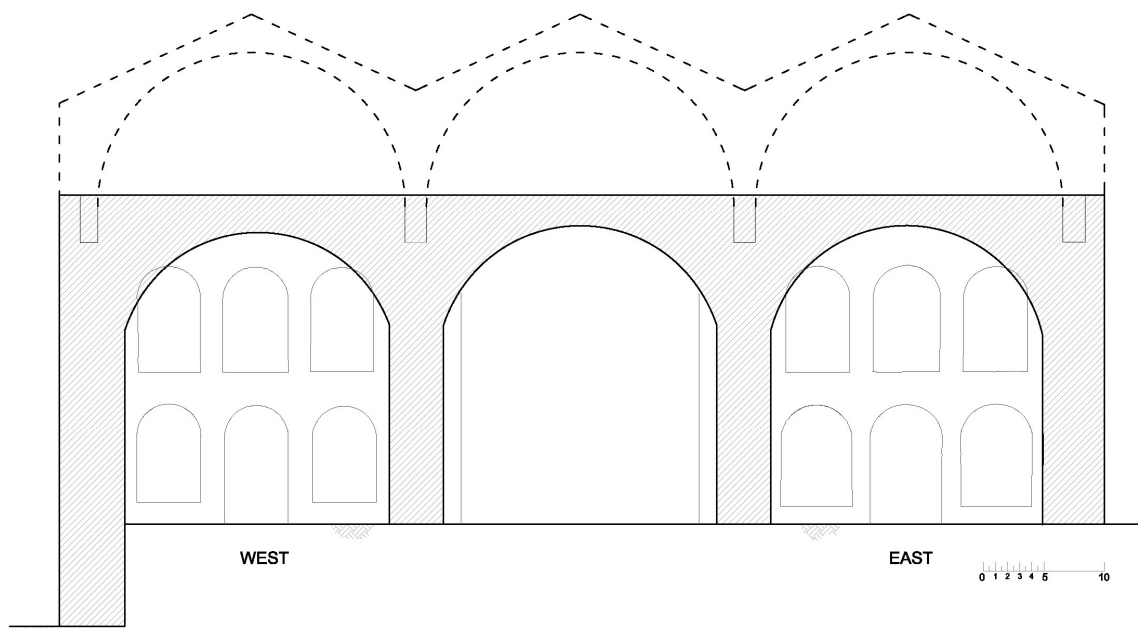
Longitudinal cross-section of the Basilica of Maxentius. The cross vaults of the central nave (dashed lines) are supported by the thick piers between the barrel vaults of the side naves, and by the east (right) and west (left) façades. The cross section gives an idea of the structural relevance of the façades, in particular the taller west façade.
